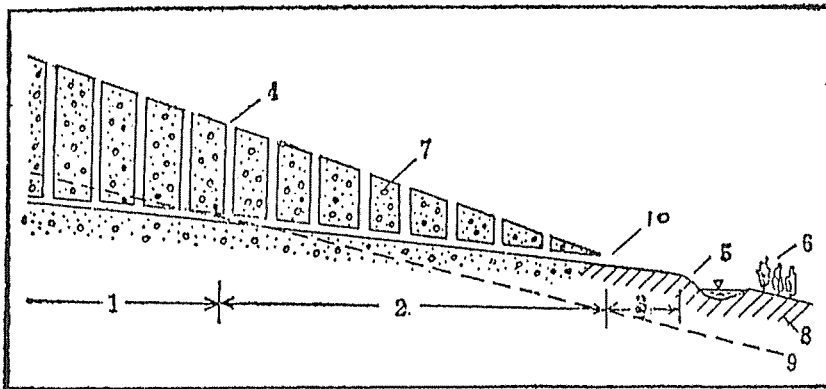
The Longitudinal Section of Karez Water System (By Xunchen-Xia, Added Japanese by Author)
